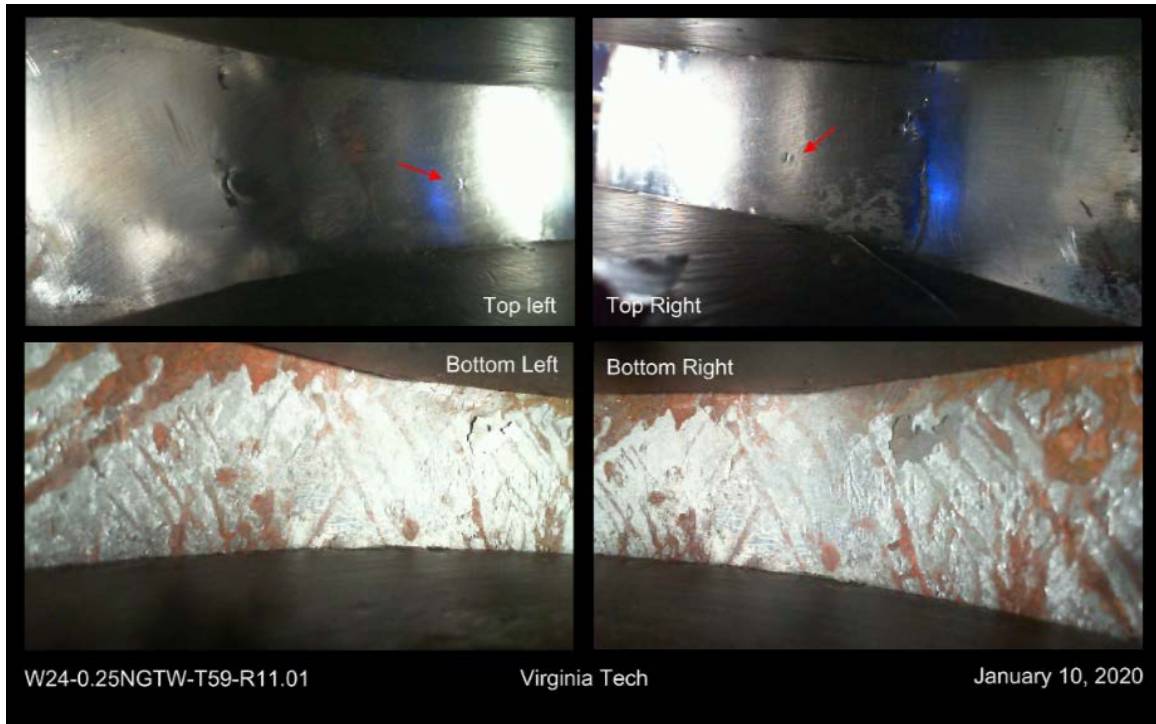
Fracture initiation of W24-0.25NGTW-T50-R11.02.
